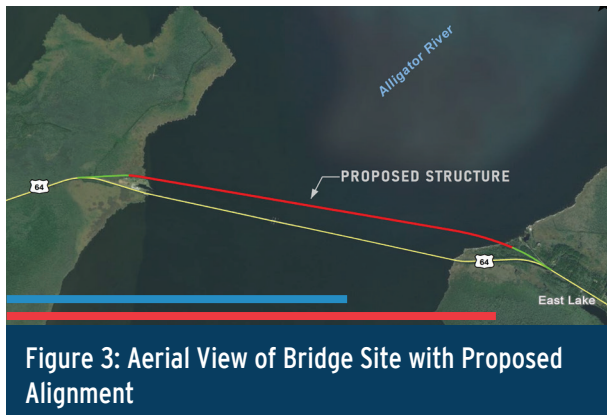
Aerial View of Bridge Site with Proposed Alignment
